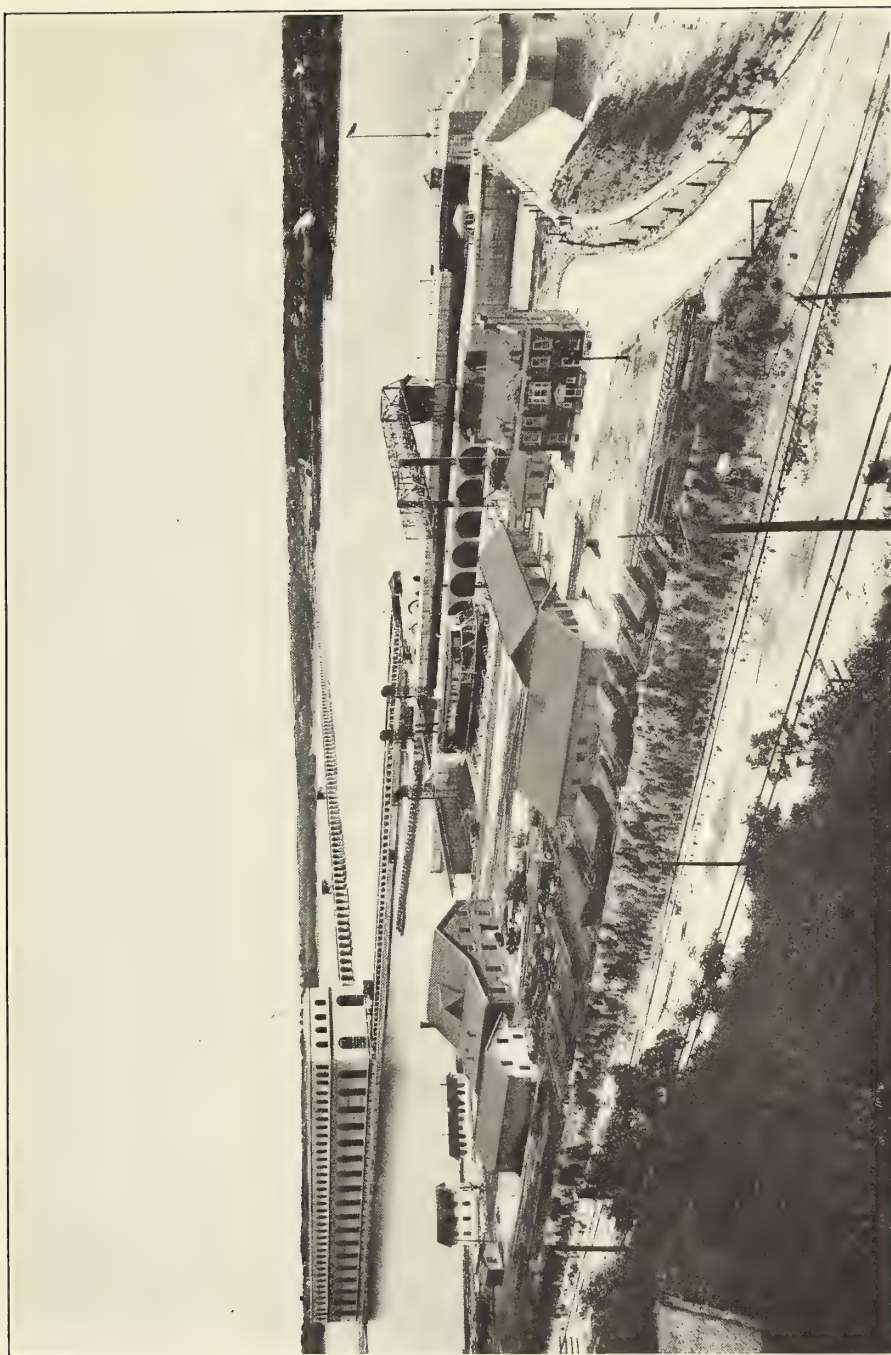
Keokuk Dam and associated structures—dam, power house, lock, dry dock, and U. S. Engineers' offices and buildings
